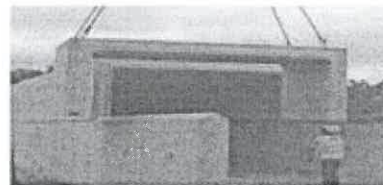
Culvert with Hinge Joint at Mid of Wall
